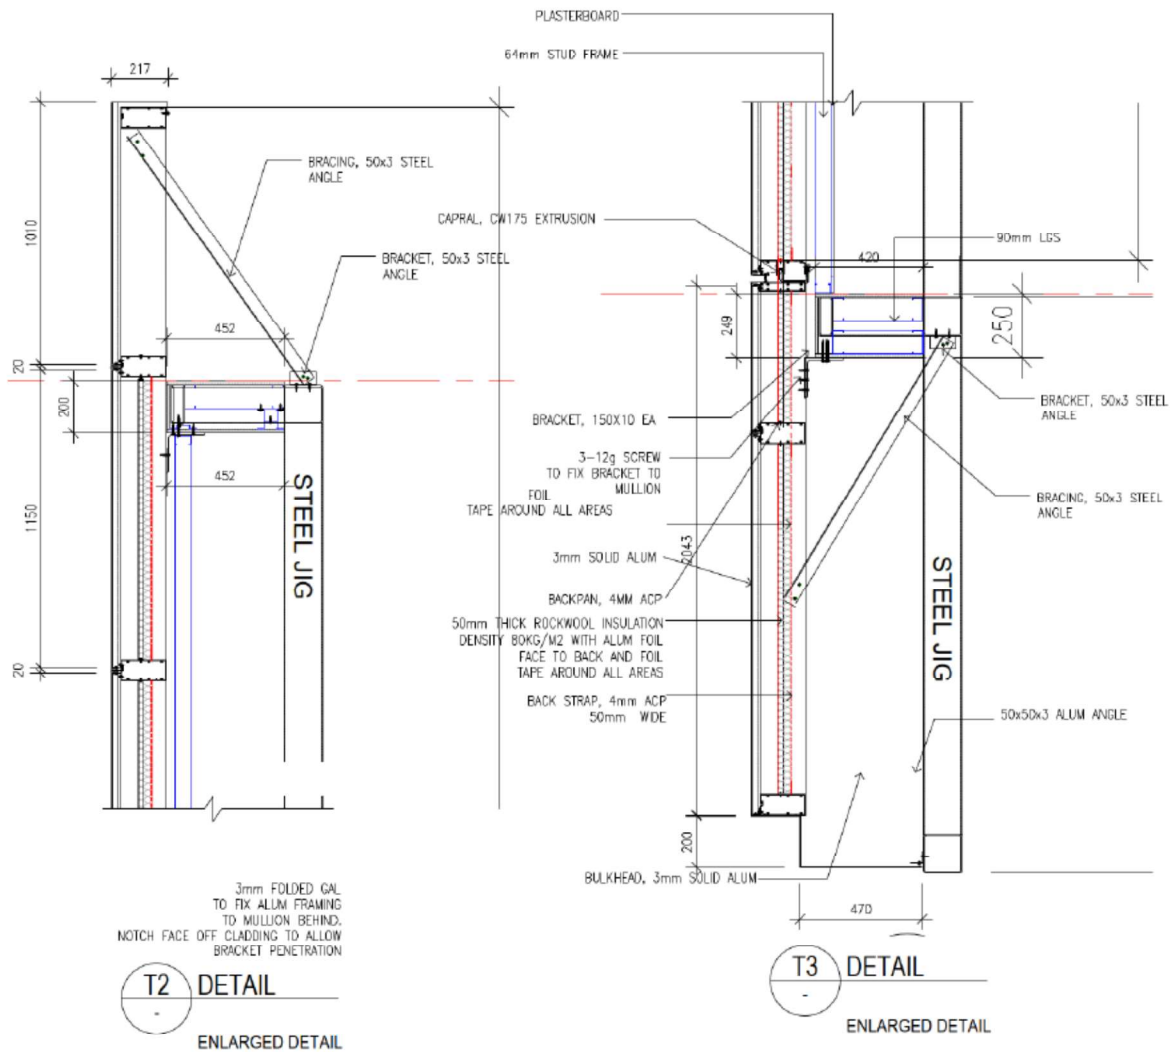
Vertical cross-section of the wing wall – with dimensions.
